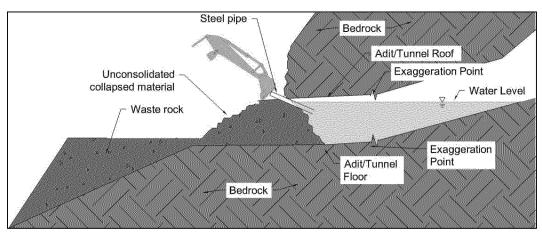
Cross-section illustration showing step 3 of the plan (not to scale). With the steel pipe fully inserted, contact is made with the water impounded inside the mine.
